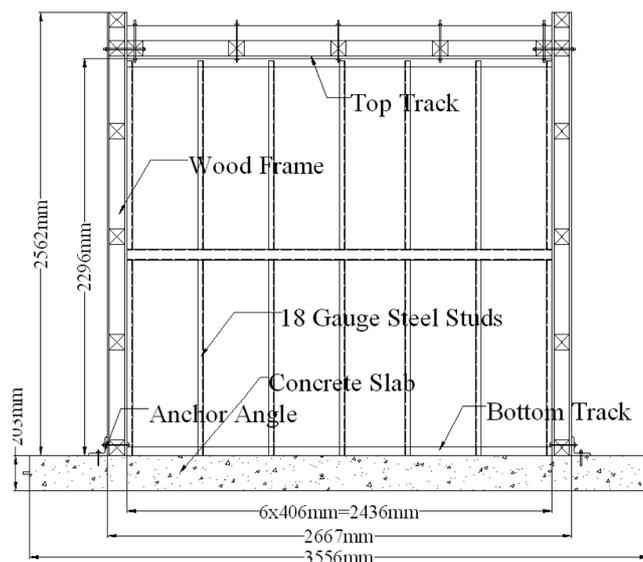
Back view of conventional wall specimen attached to the wind load test facility
